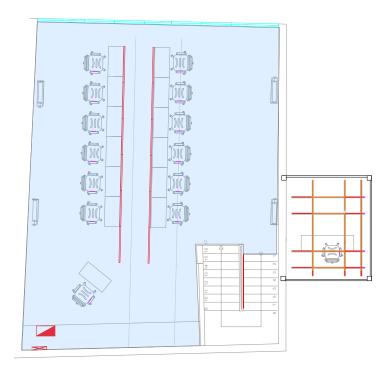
ERKE's Lighting Seminar Room Layout in the Roof
